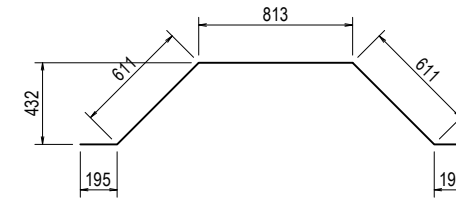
# DETAIL OF LIGHTING FOUNDATION (PF5-PF7)
